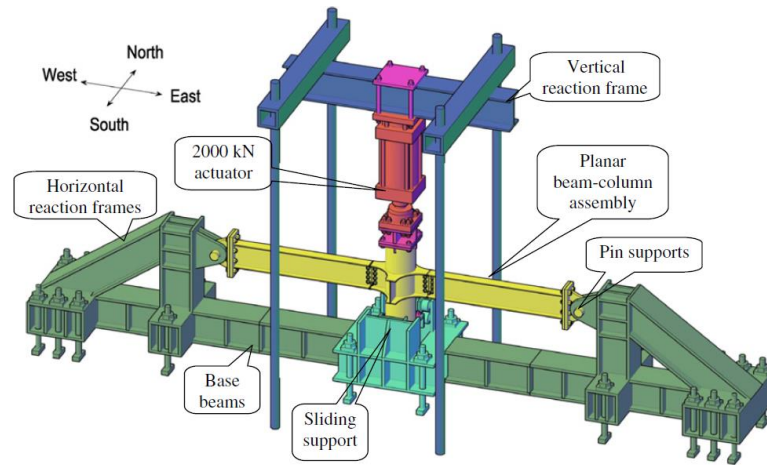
Test set-up of double beam assemblies with beam-to-tubular column connections (Li et al. 2013)
